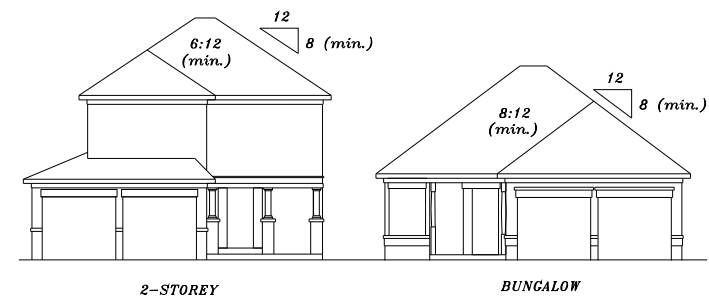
Diagram illustrating minimum required roof pitch
